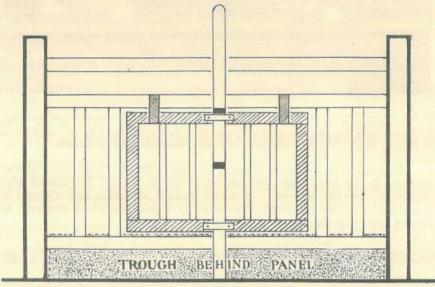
OUTSIDE VIEW OF SWINGING GATE FOR FILLING THE PIG TROUGH.
